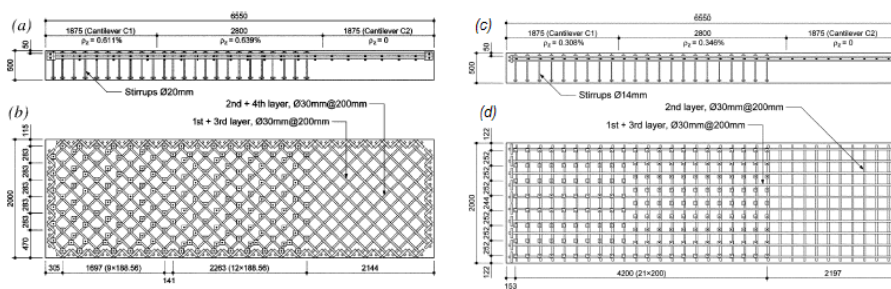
a) Longitudinal section of reinforcement of slab C/B1; b) Plan of reinforcement of slab C/B1; c) Longitudinal reinforcement of slab D/B3; d) Plan of reinforcement of slab D/B3, Jaeger and Marti (2009).
